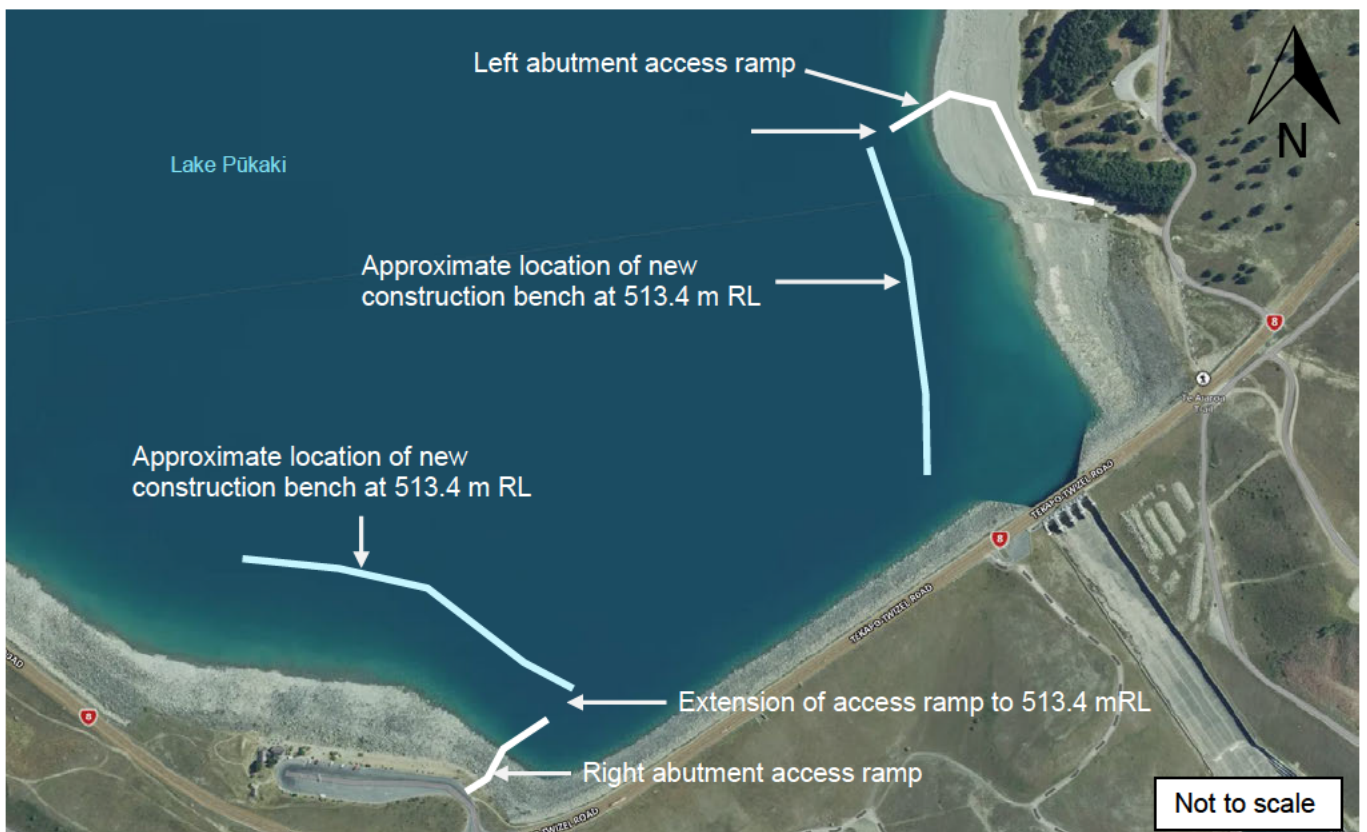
Site plan (abutments) – Tranche 2 - indicative 513.4 m RL construction bench
